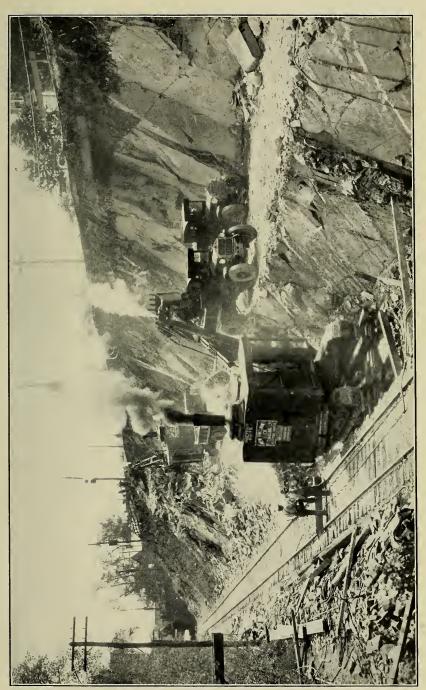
PLATE VIII.—VIEW SHOWING ELIOT STREET CUT DURING CONSTRUCTION.
